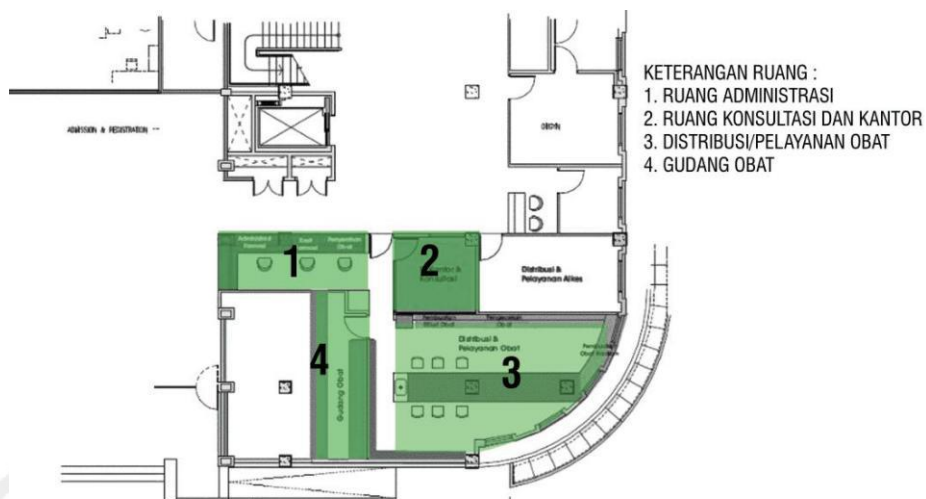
Pharmacy Instalation Floorplan at Siloam *Hospital* Surabaya
